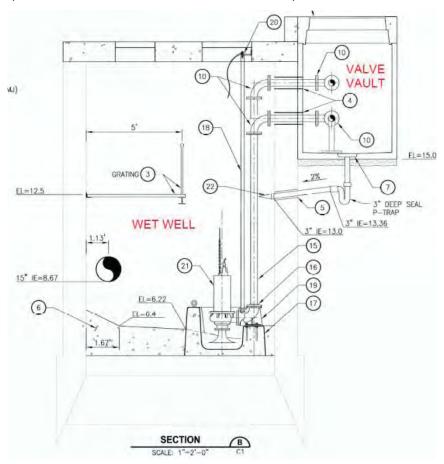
Typical Submersible Pump Station Installation - Existing WWPS No. 14
